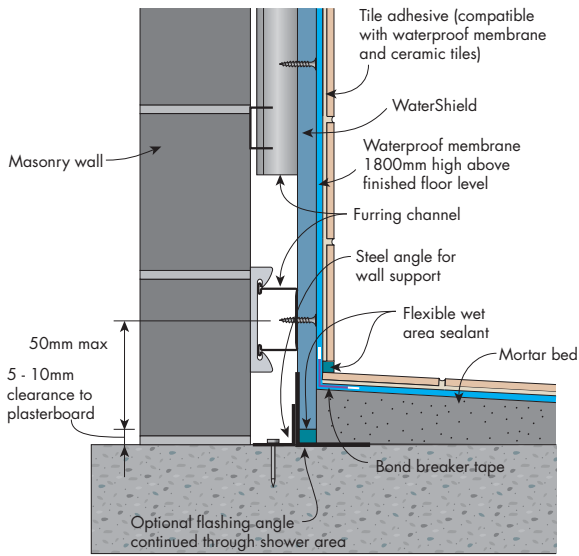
Wall Base in Shower Area on Masonry Wall
